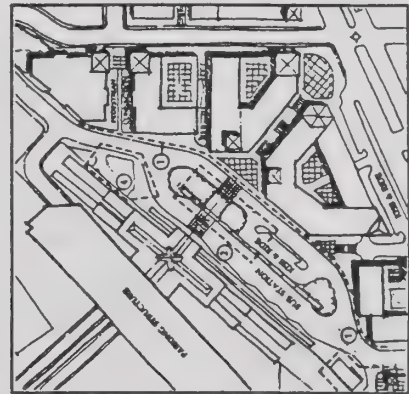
Pedestrianway connection diagonally from the corner of A Street and El Camino Real.
